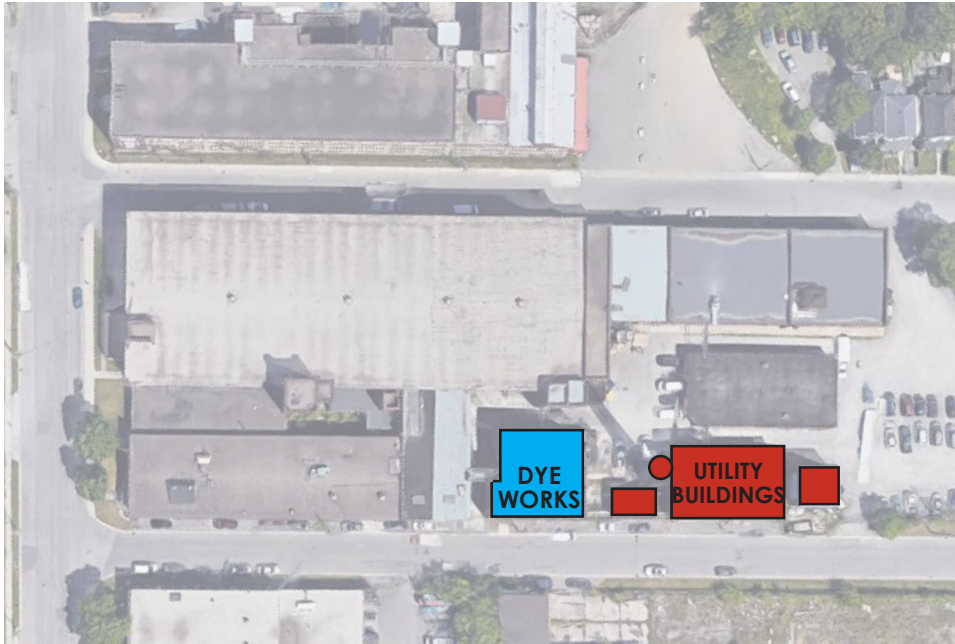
Site Plan (NTS) by mcCallumSather
